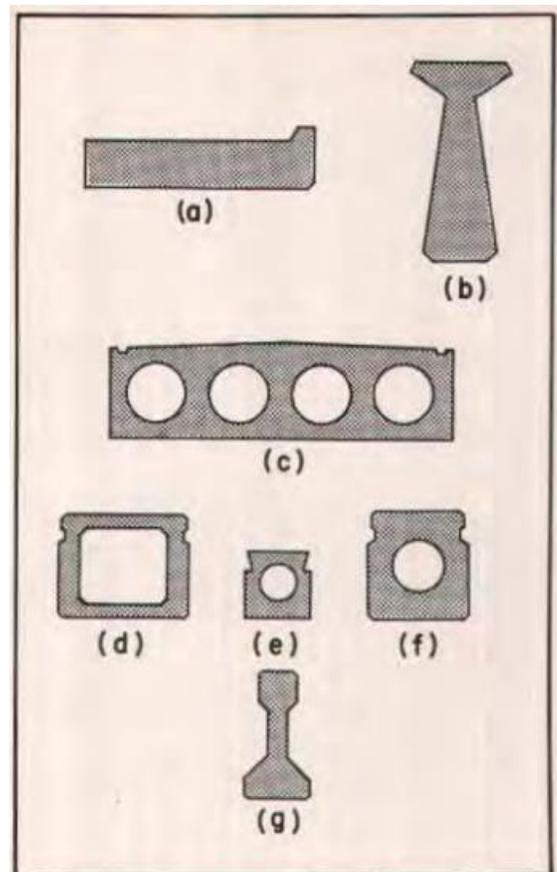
Cross sections of various prestressed-concrete railroad bridges in the late 1950s.
